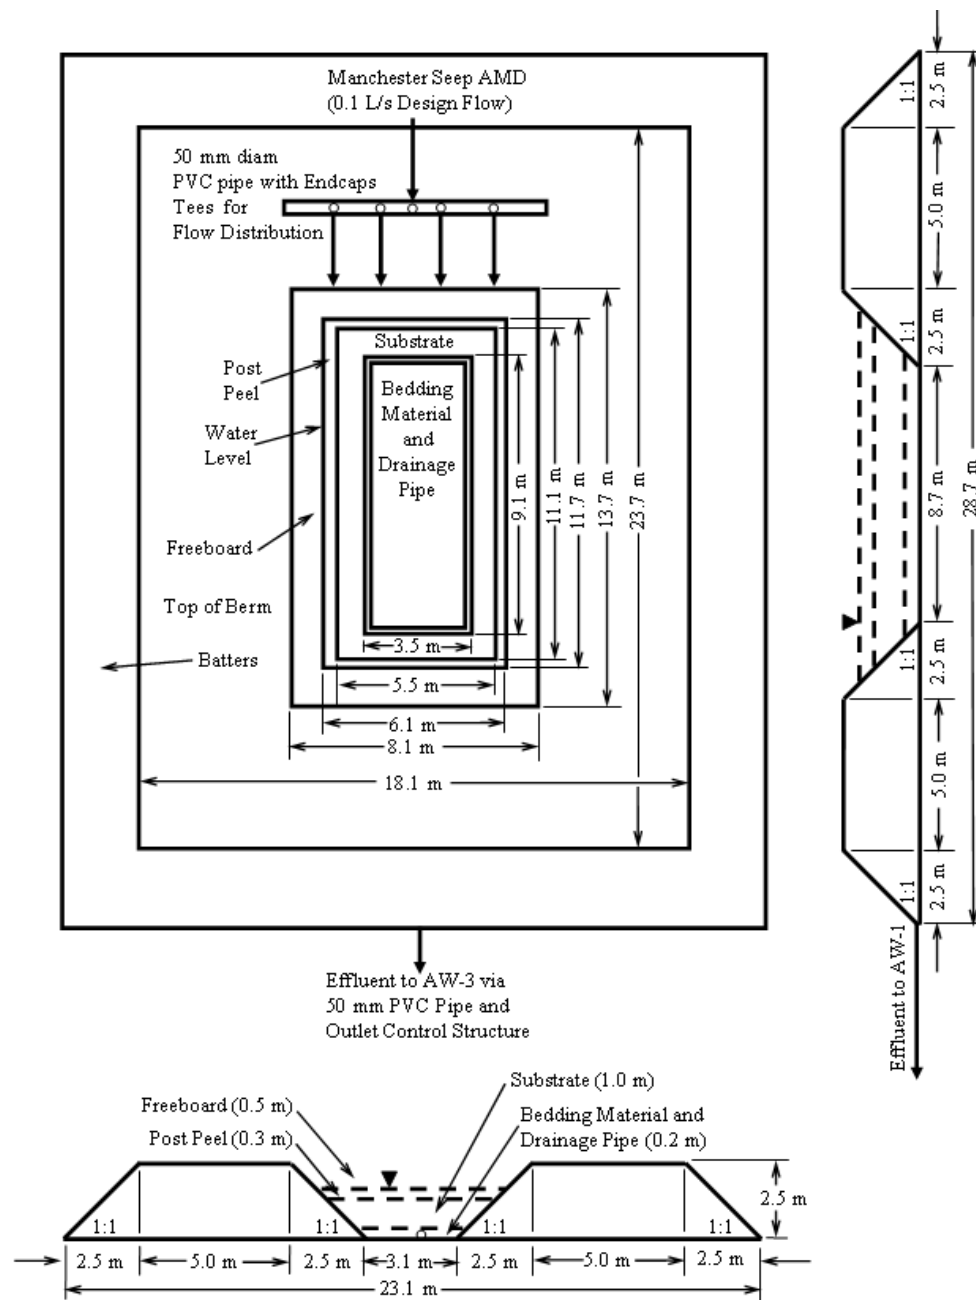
Design dimensions of the pilot-scale BGCR PS-3.
